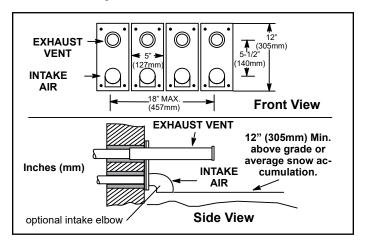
Optional Vent Termination for Multiple Unit Installation of Direct Vent Wall Termination
